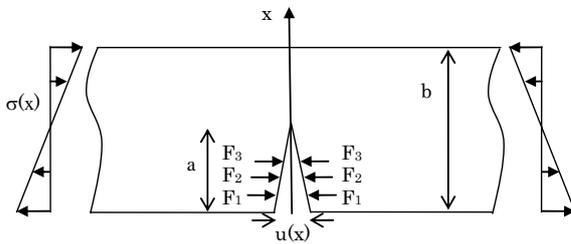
Reinforced concrete beam under flexure. Rebars are bridging the crack with forces, F_i .
